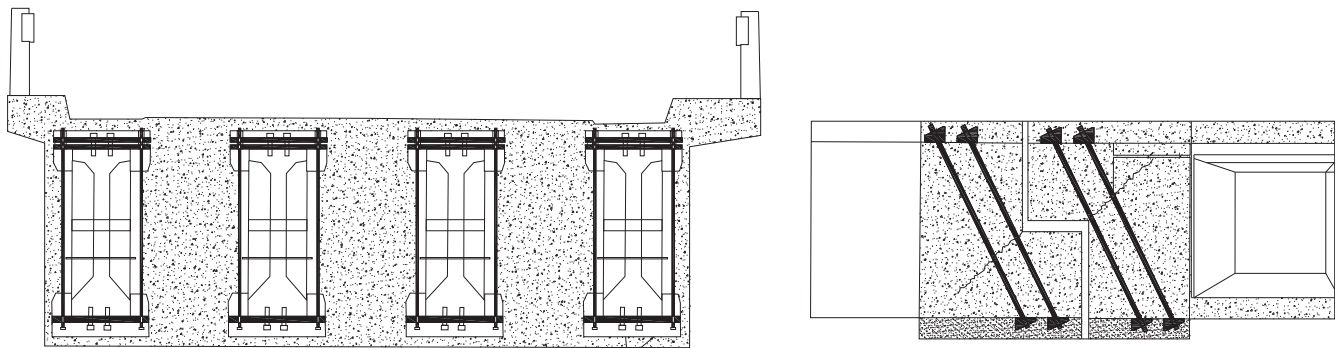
Gerber saddle retrofitting with prestressing bars in Vargas bridge¹³
